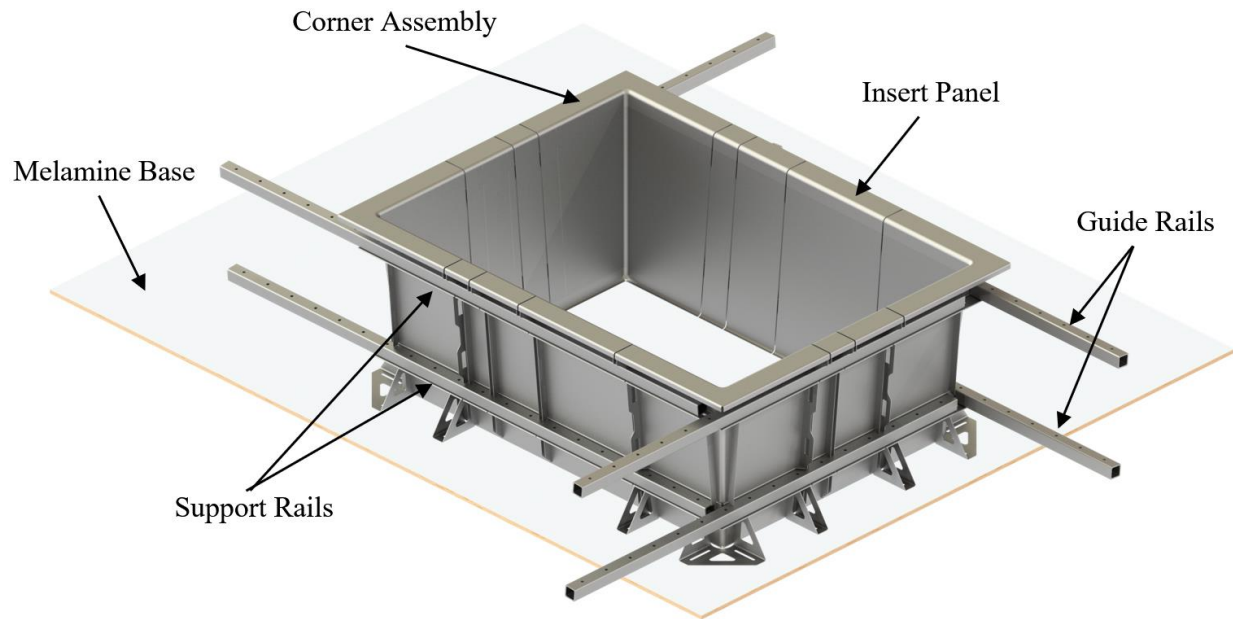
Fully assembled adjustable mold in an intermediate size configuration
